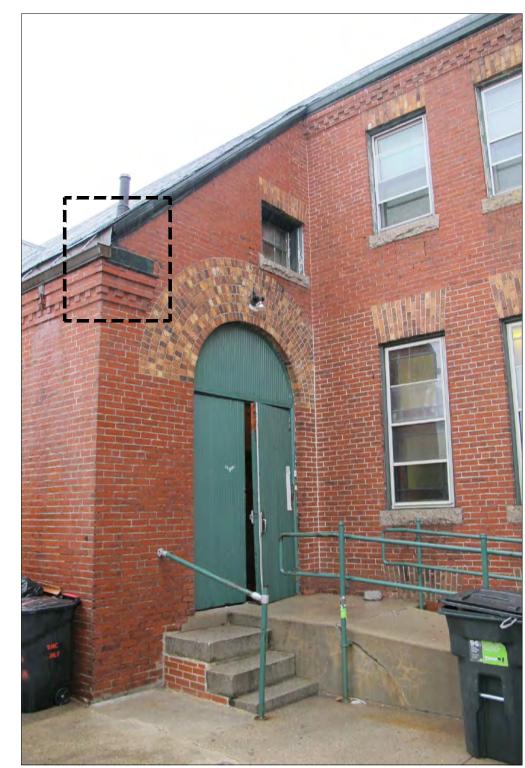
/DRAWING D-201: Missing roof rake return at southeast elevation.
